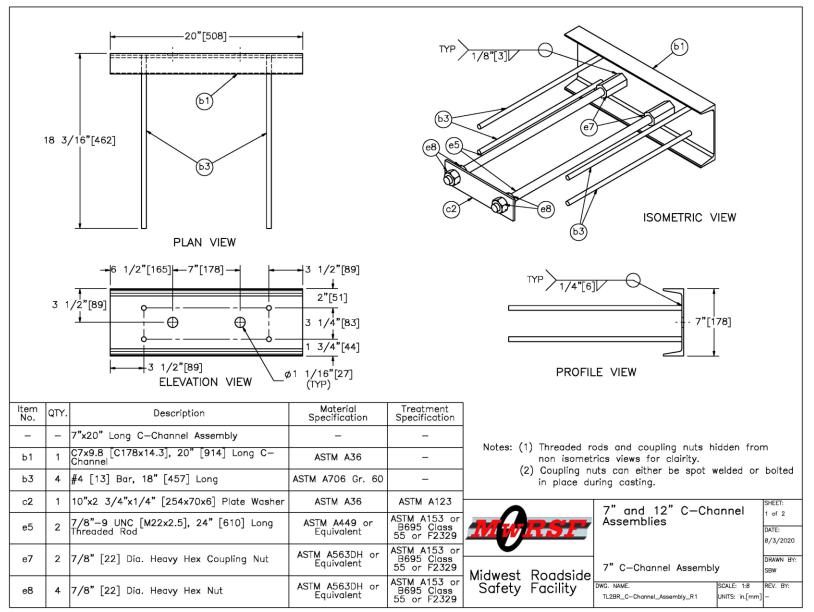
Details for 20-in. Long C7x9.8 Channel Assembly for Use on 7-in. CIP decks
